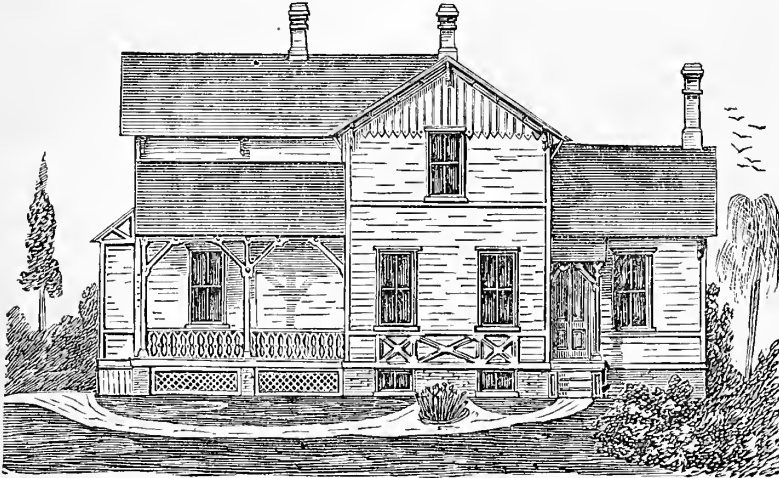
SIDE ELEVATION OF THE HOUSE.
